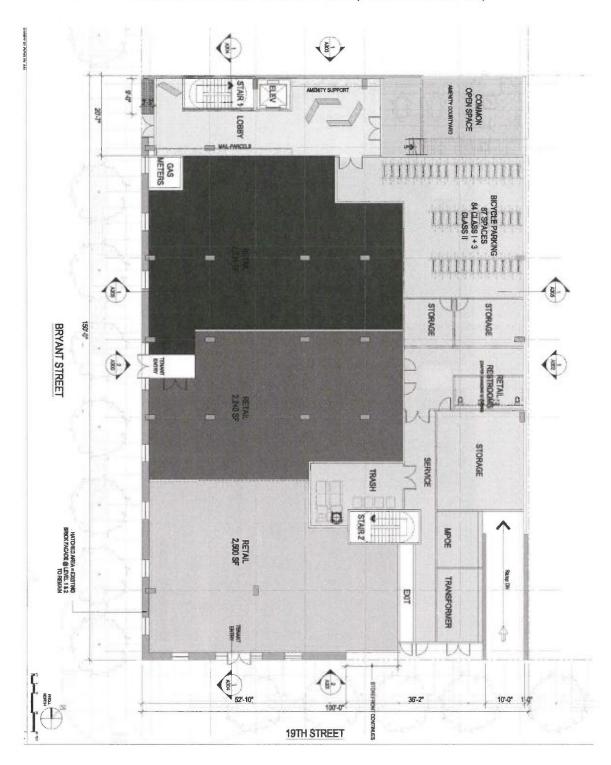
PROPOSED GROUND FLOOR (PROPOSED PROJECT)
